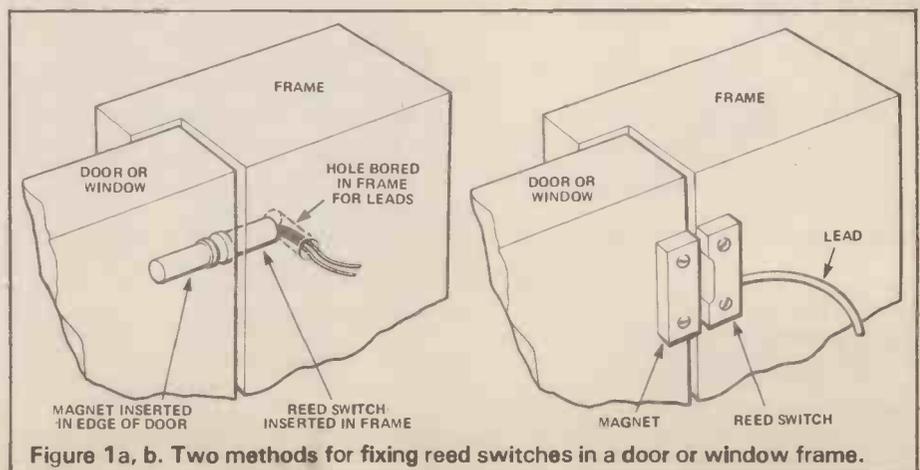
, b. Two methods for fixing reed switches in a door or window frame.
